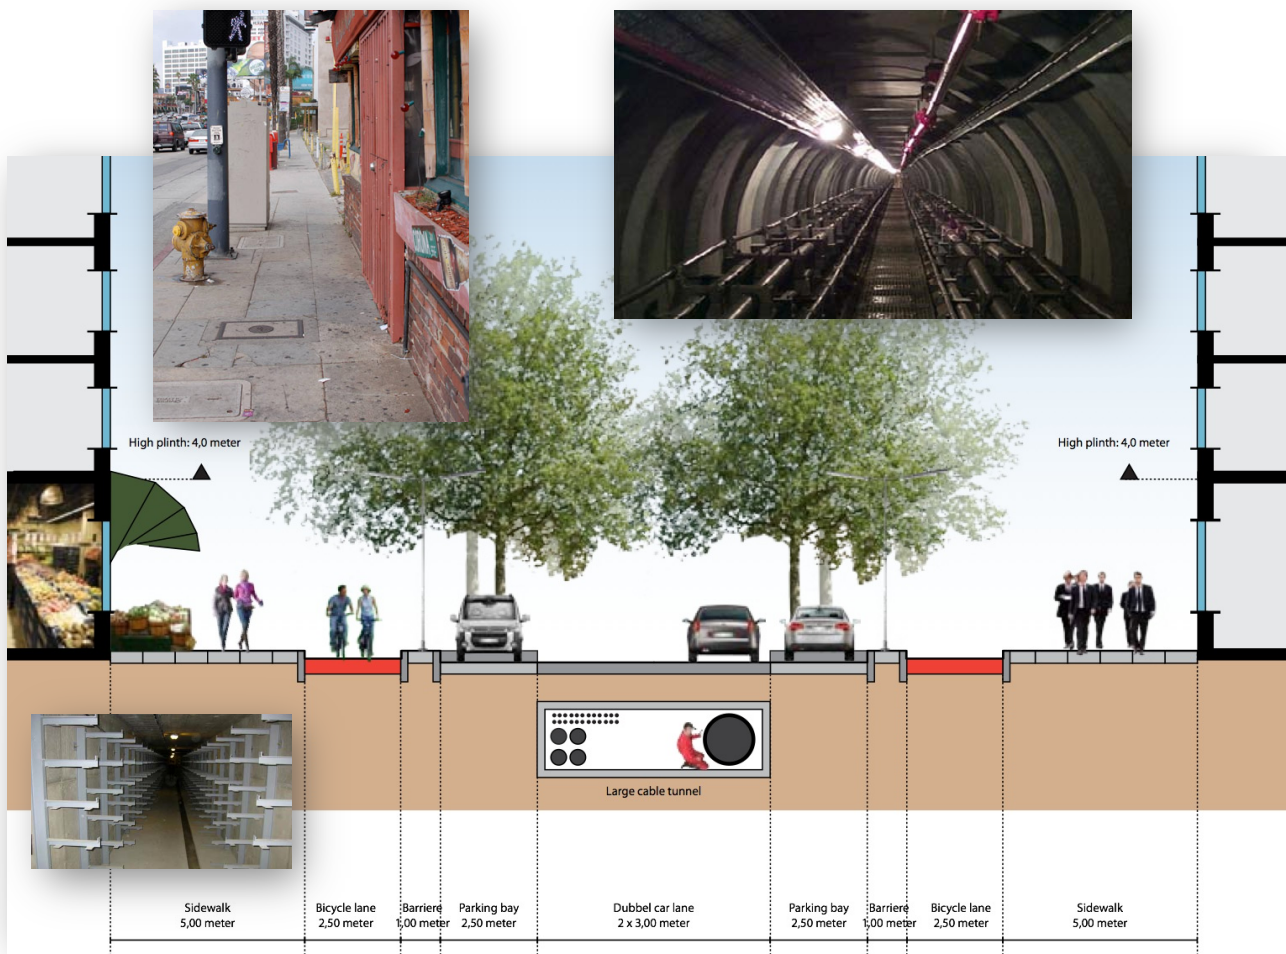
Street section with underground cables and ducts tunnel. Bottom-left: empty cable tunnel. Top-right: operating tunnel (Ruijs, 2012). Top-left: poor street design sample and space occupied by various plants in Los Angeles (Sheridan, 2009).
